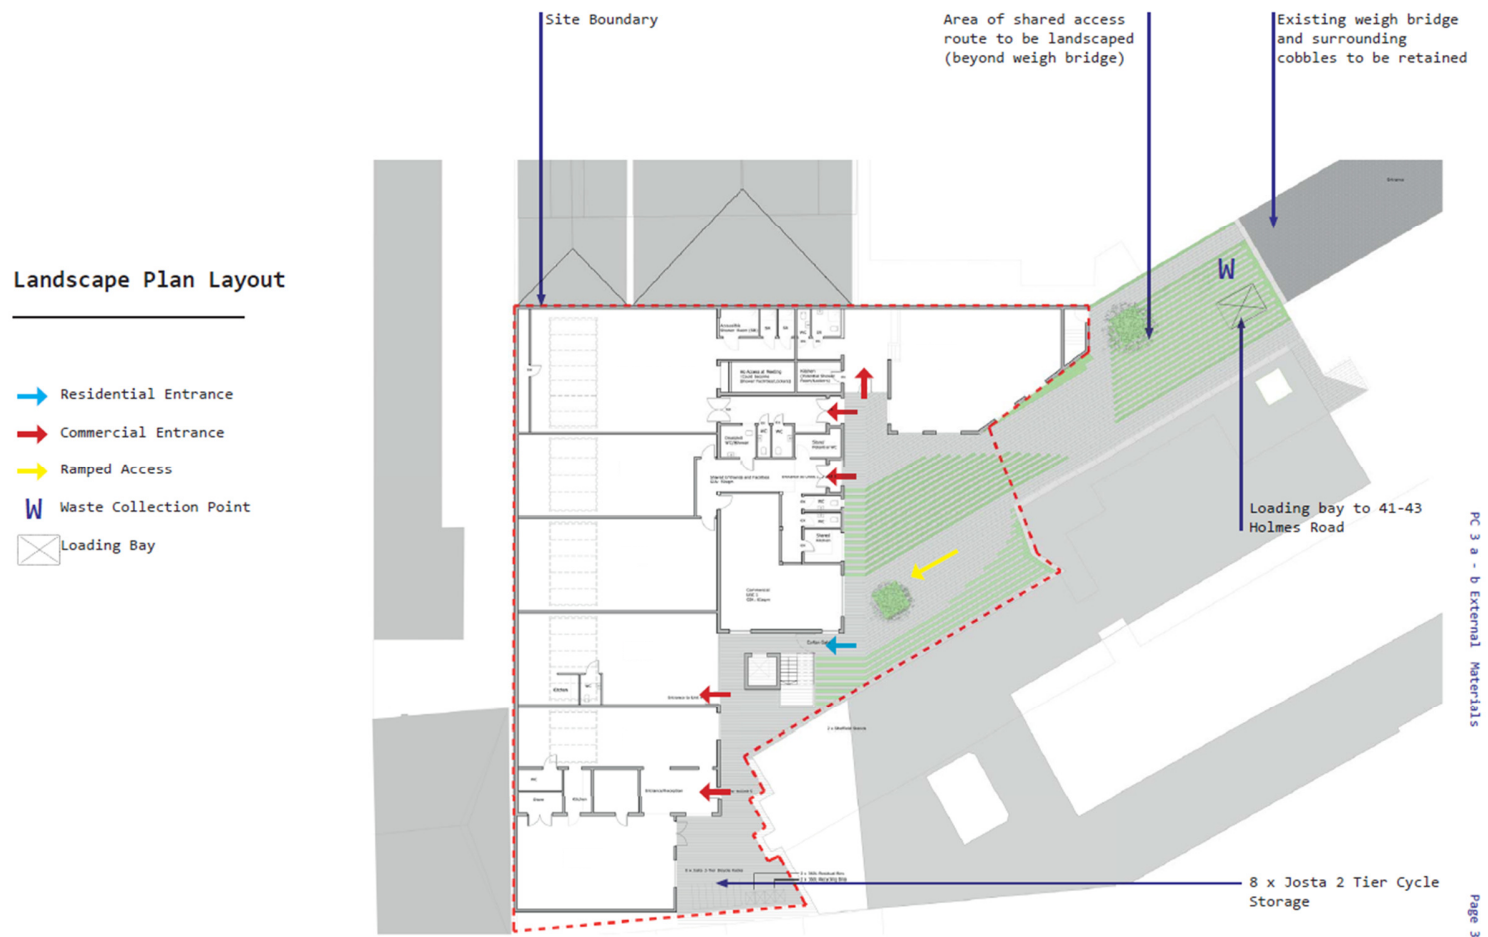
Proposed layout of developed site. (care of Lynas Smith Architecture)
